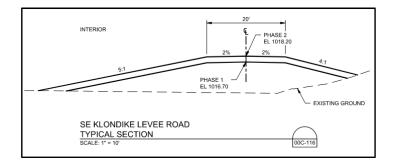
TYPICAL KLONDIKE IMPOUNDMENT ROAD EMBANKMENT SECTION (SOURCE: HDR)
